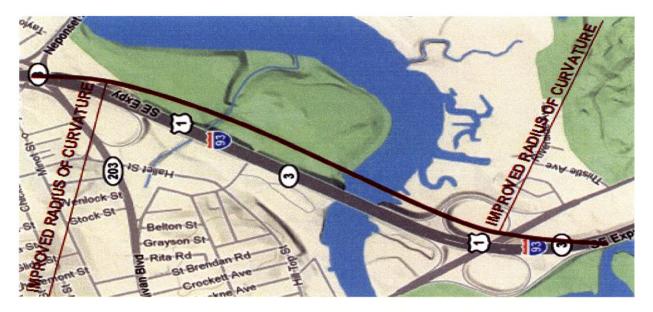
FAVORABLE ROAD GEOMETRICS FOR NEW OFFSET BRIDGE [WWW.GOOGLE.COM]
